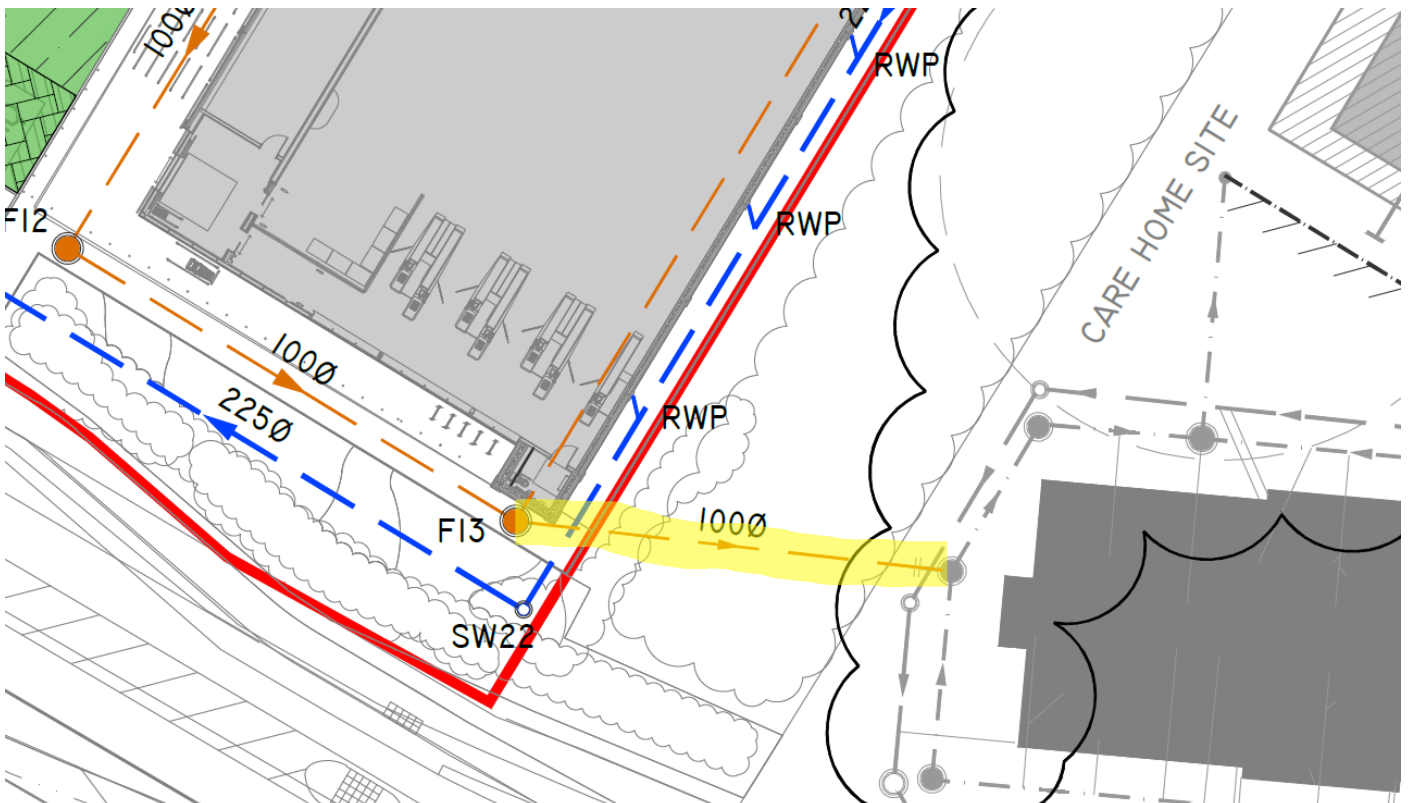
Proposed connection from Lidl Development to Care Home Drainage
